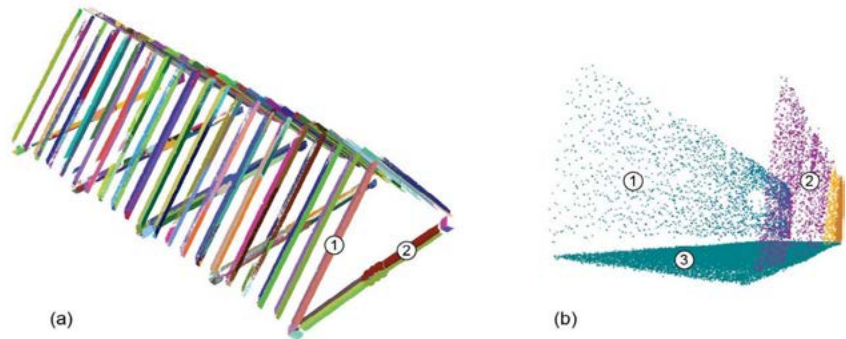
(a) Point cloud segmentation of timber structural elements, a.1. rafter, a.2. rafter tie (b) Point cloud of a rafter, b.1. left face, b.2. right face, b.3. bottom face
